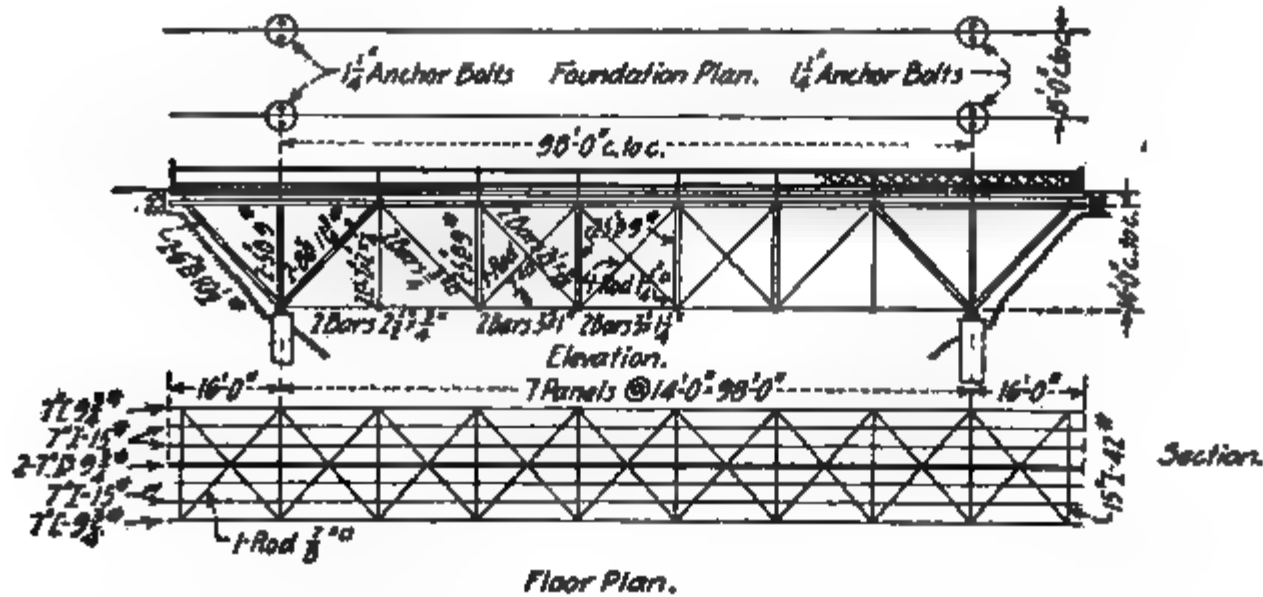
DECK PRATT PIN-CONNECTED HIGHWAY BRIDGE.
